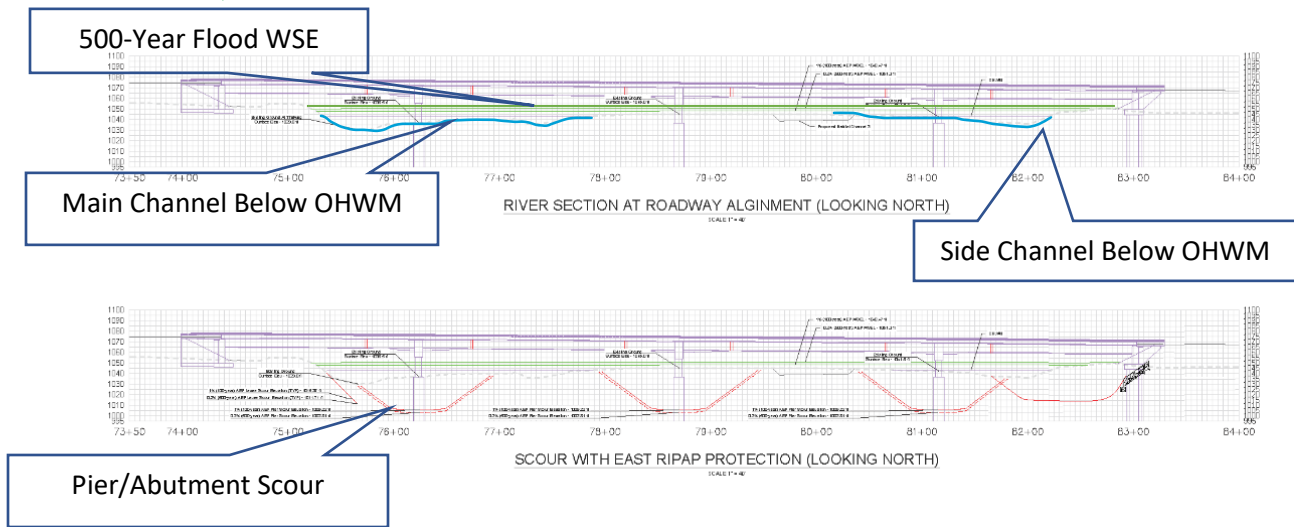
Bridge Cross Sections showing 500-year scour and water surface elevations
